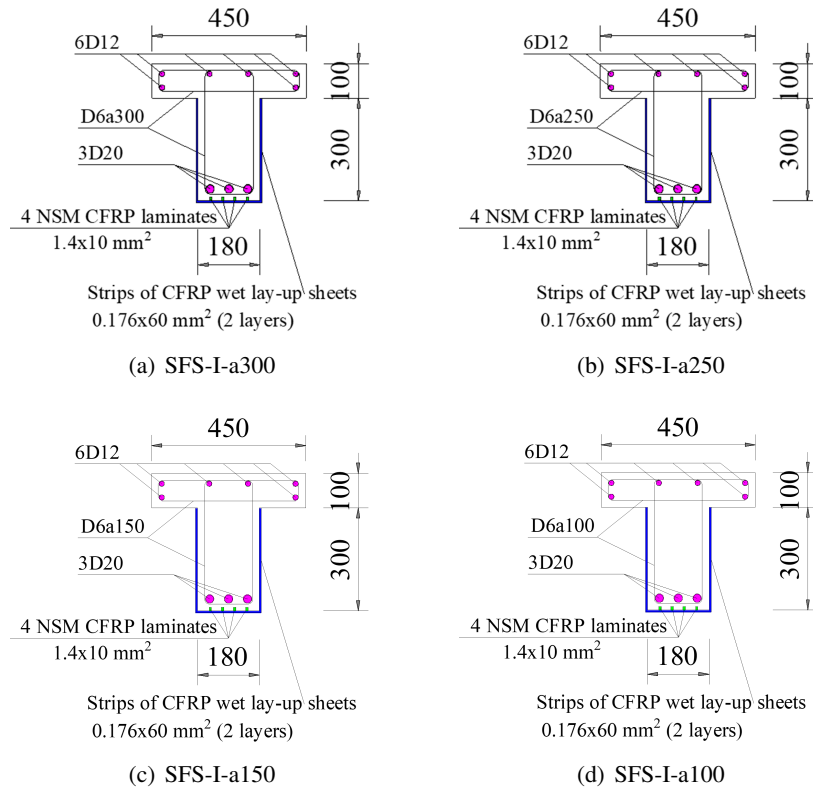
Cross-section of strengthened T-beams with various spacing of stirrups
